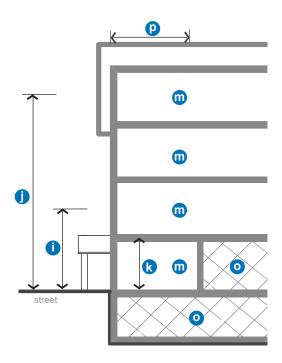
(E)(2) Yard Building: Height and Use Requirements
